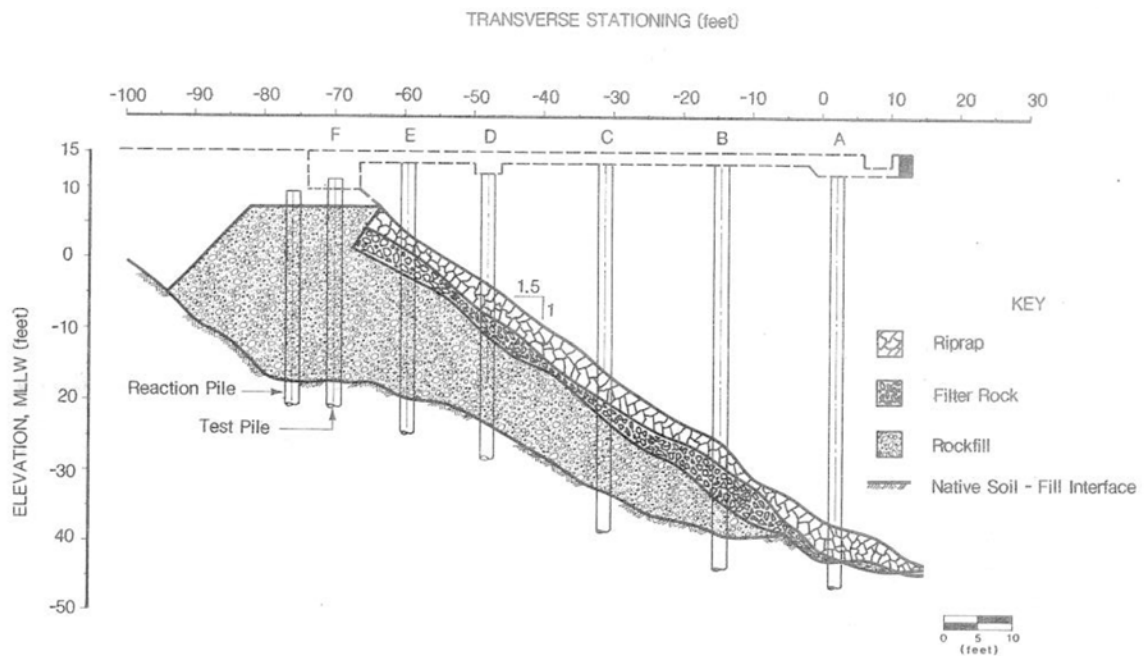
Cross section of setup of full-scale test on pile in rockfill (Diaz *et al.* 1984)
